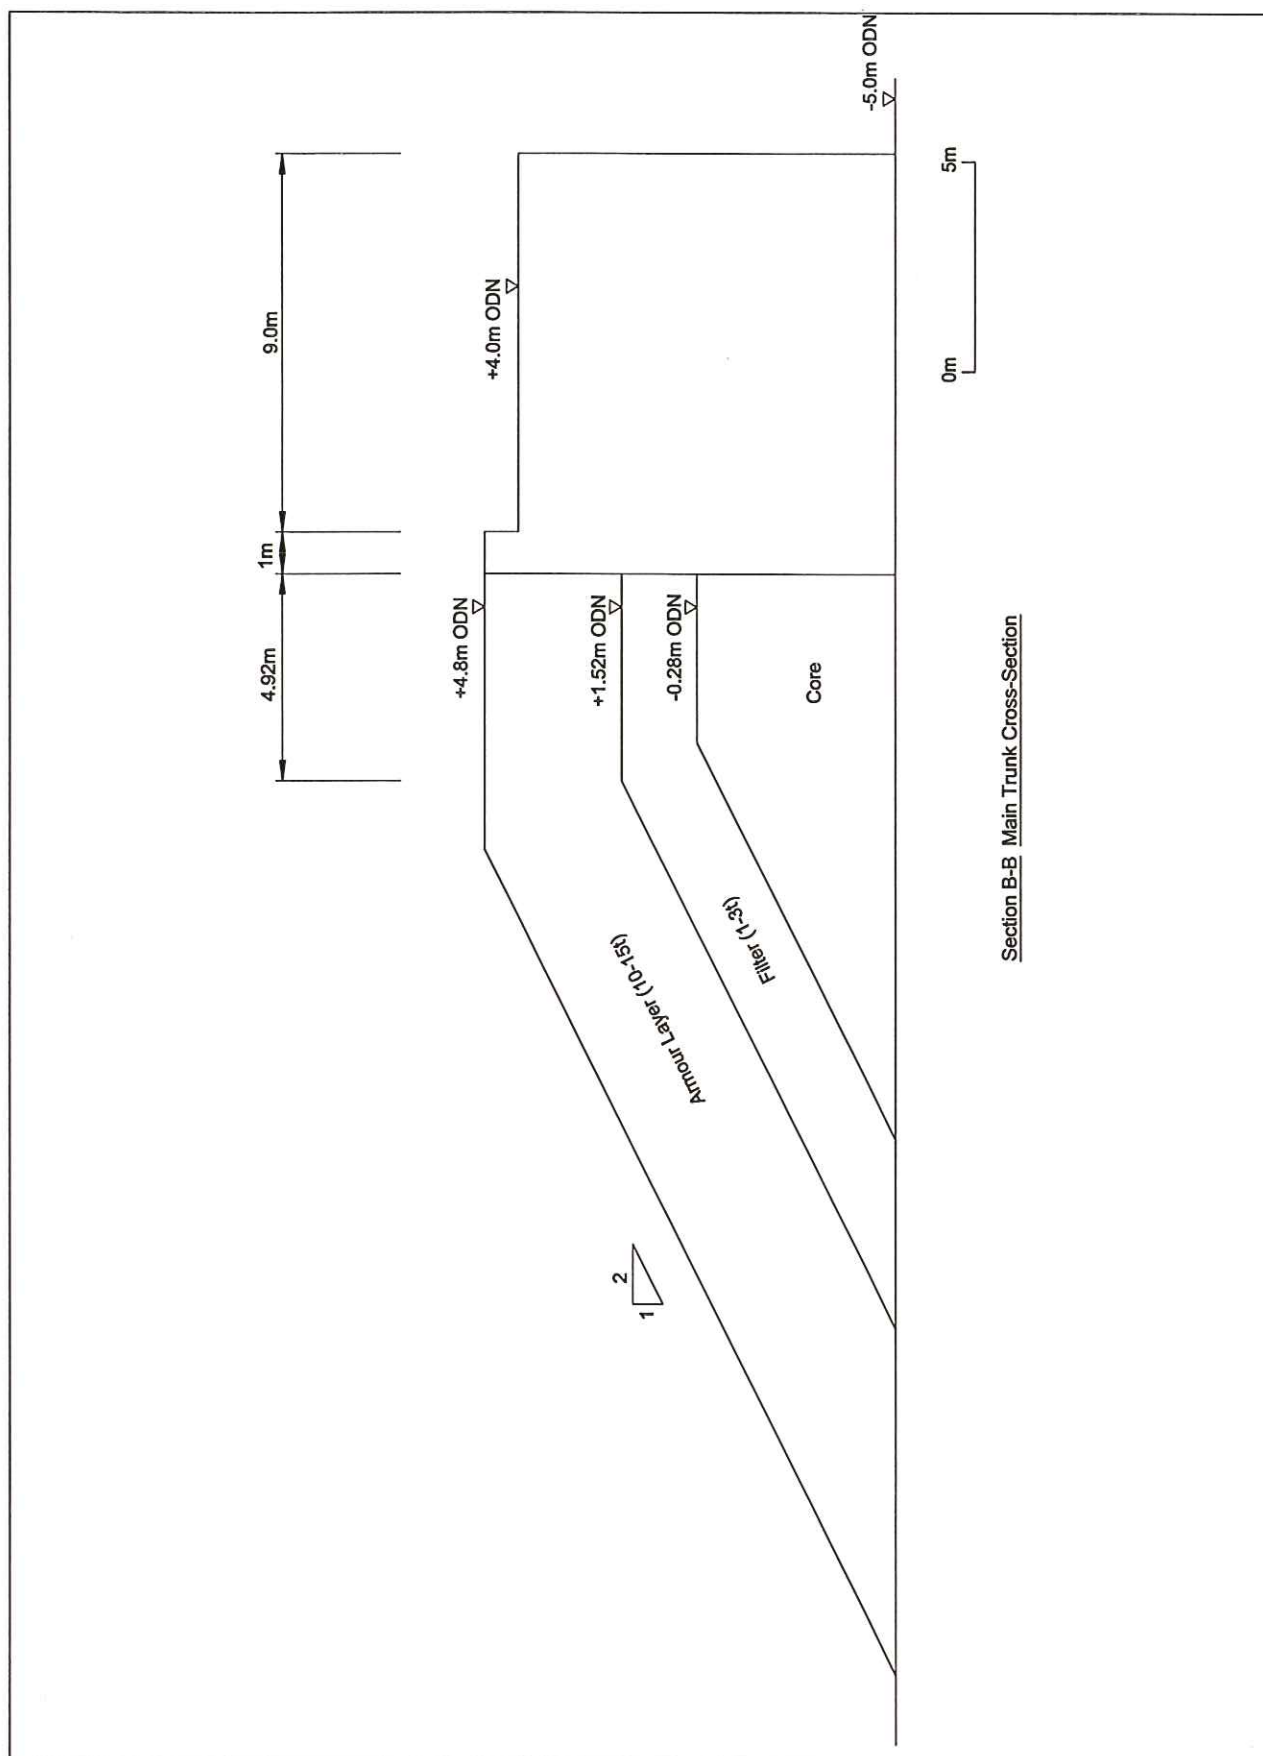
Typical sections through the proposed West Breakwater trunk, Test Series 3, 4 and 5
